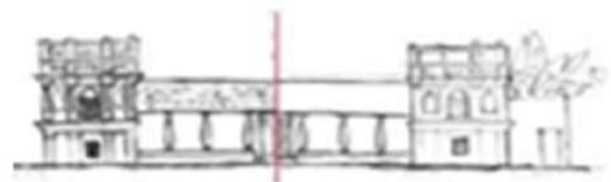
Elevation of C.V.C.T – C.V.R.M House
